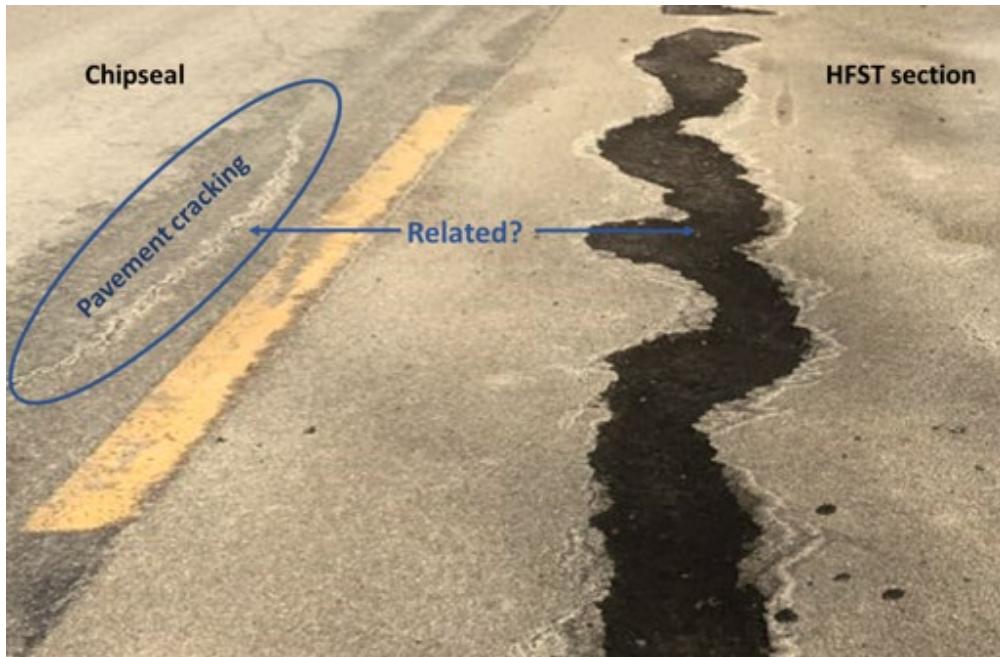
Photo showing complete exposure of underlying pavement where HFST loss occurred in the bauxite test section
